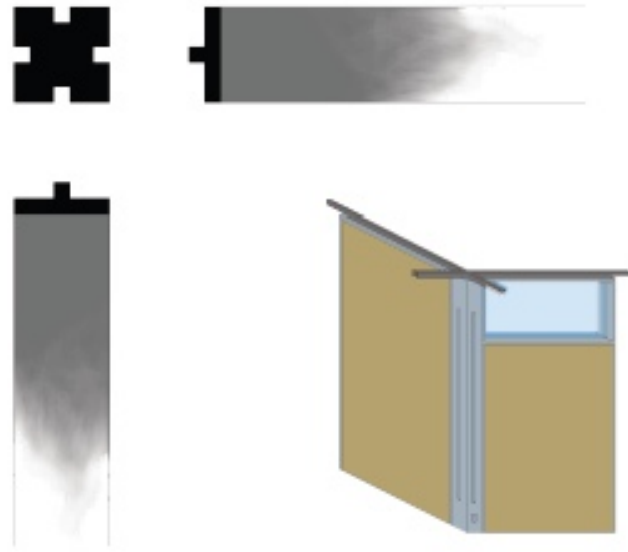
Plan and Axon Showing Post and Wall Panel Connection
